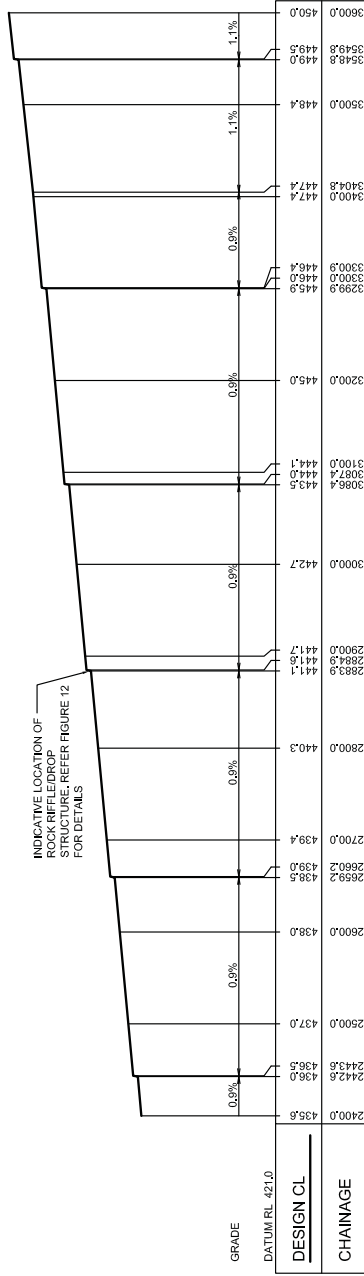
PROPOSED EASTERN CREEK CL LONGITUDINAL SECTION
